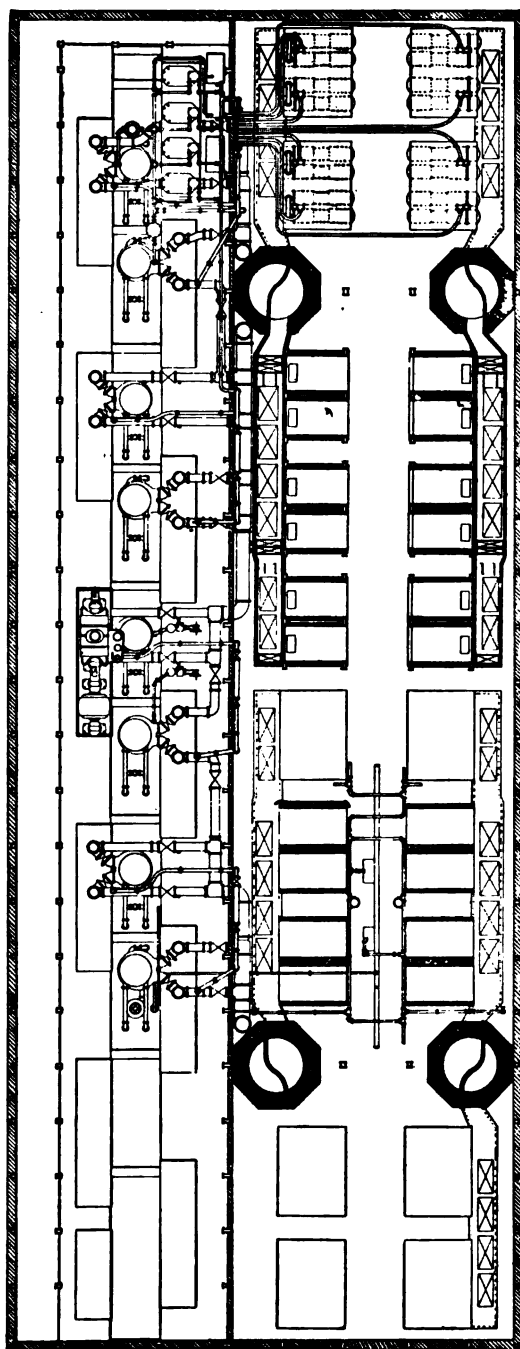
Lots Road, Chelsea: Plan of Buildings.
